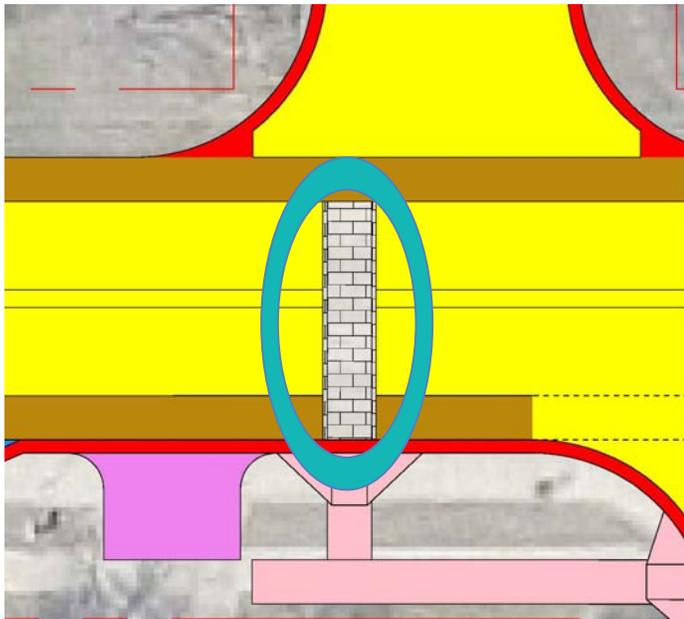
“In-Laid” Crosswalk and Example (70th Street)
